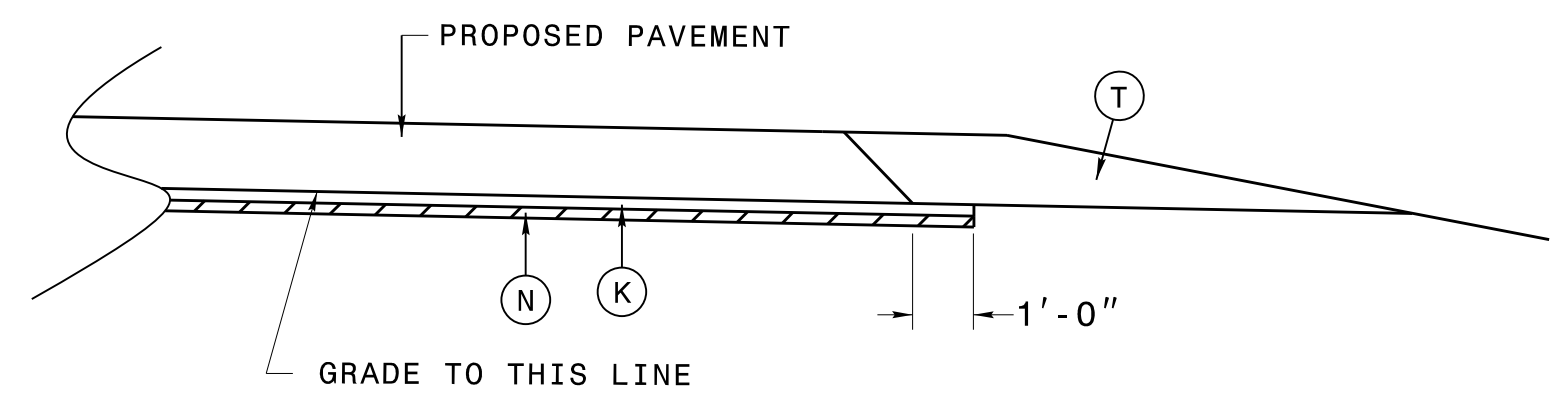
DETAIL OF TEMPORARY WIDENING FOR LOCATIONS UNDER TRAFFIC (SEE TMP PLANS FOR ADDITIONAL INFORMATION)
